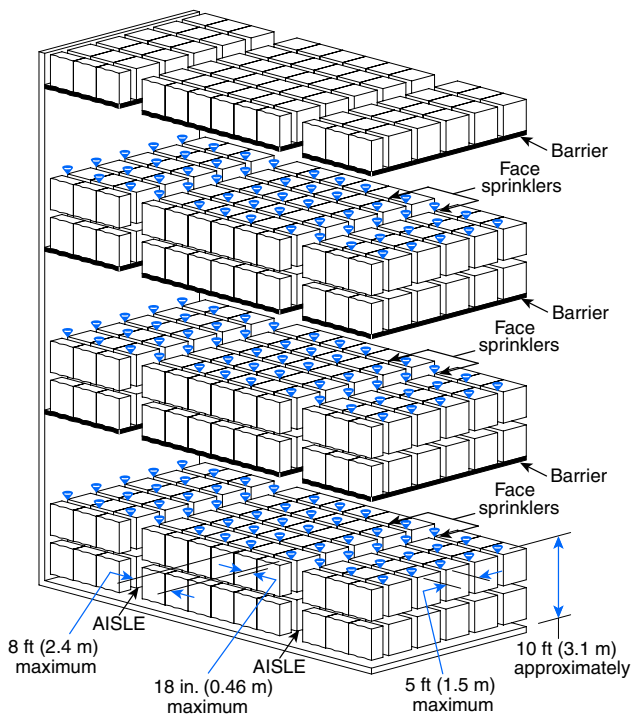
Positioning of In-Rack Sprinklers in
